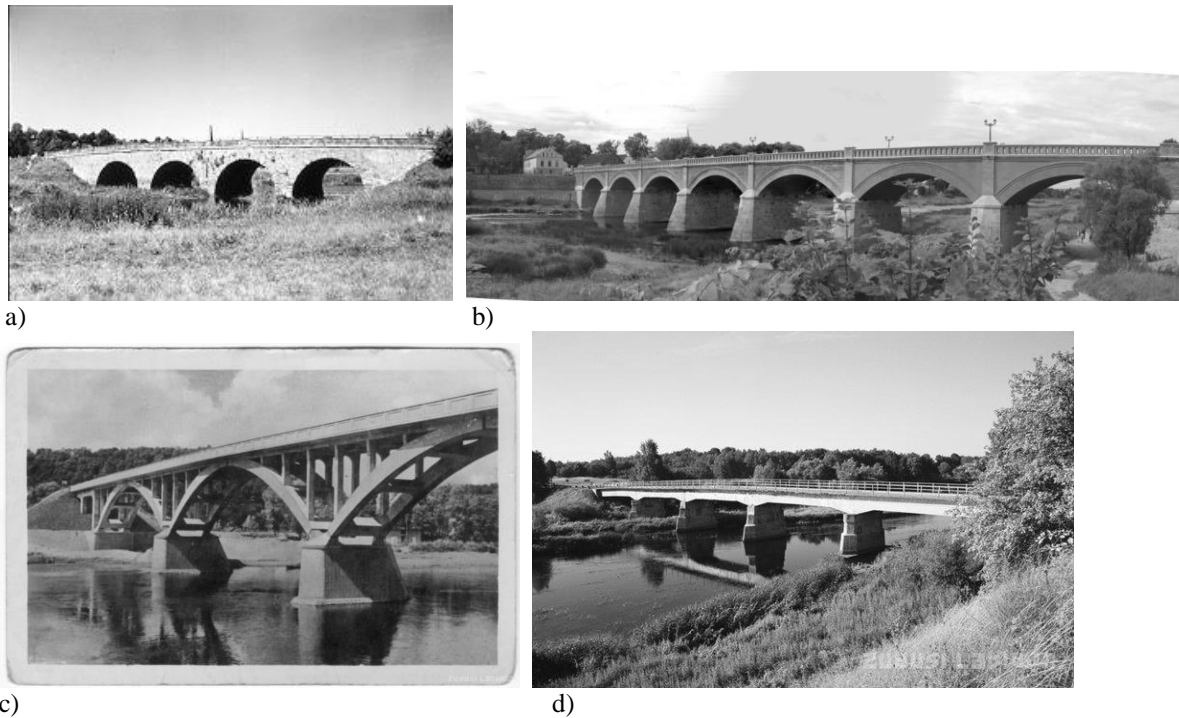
Examples of the stone and massive concrete piers in Latvia until 1941: a) Bridge over the river Gauja in Valmiera; b) Bridge over the river Venta in Kuldīga; c) Bridge over the river Gauja in Sigulda; d) bridge over the river Salaca near Vecsalaca [7]
